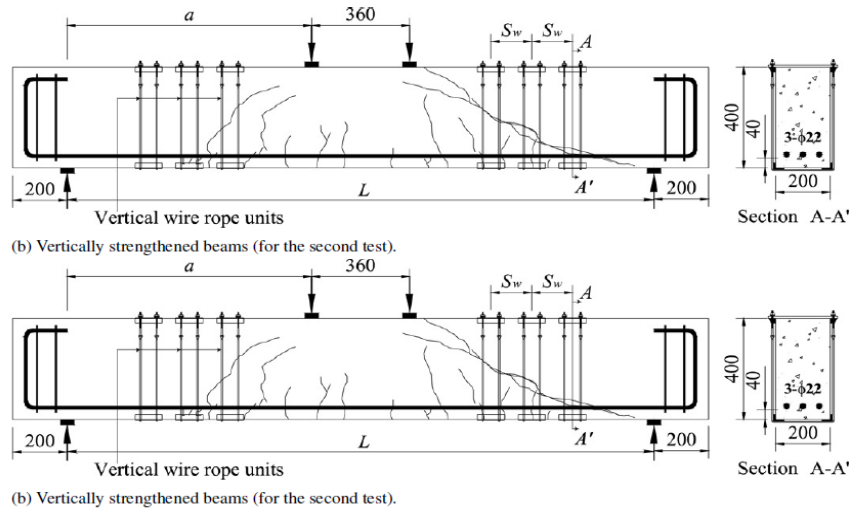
2- Specimen details and arrangement of wire rope units (Kim et al. 2007).
